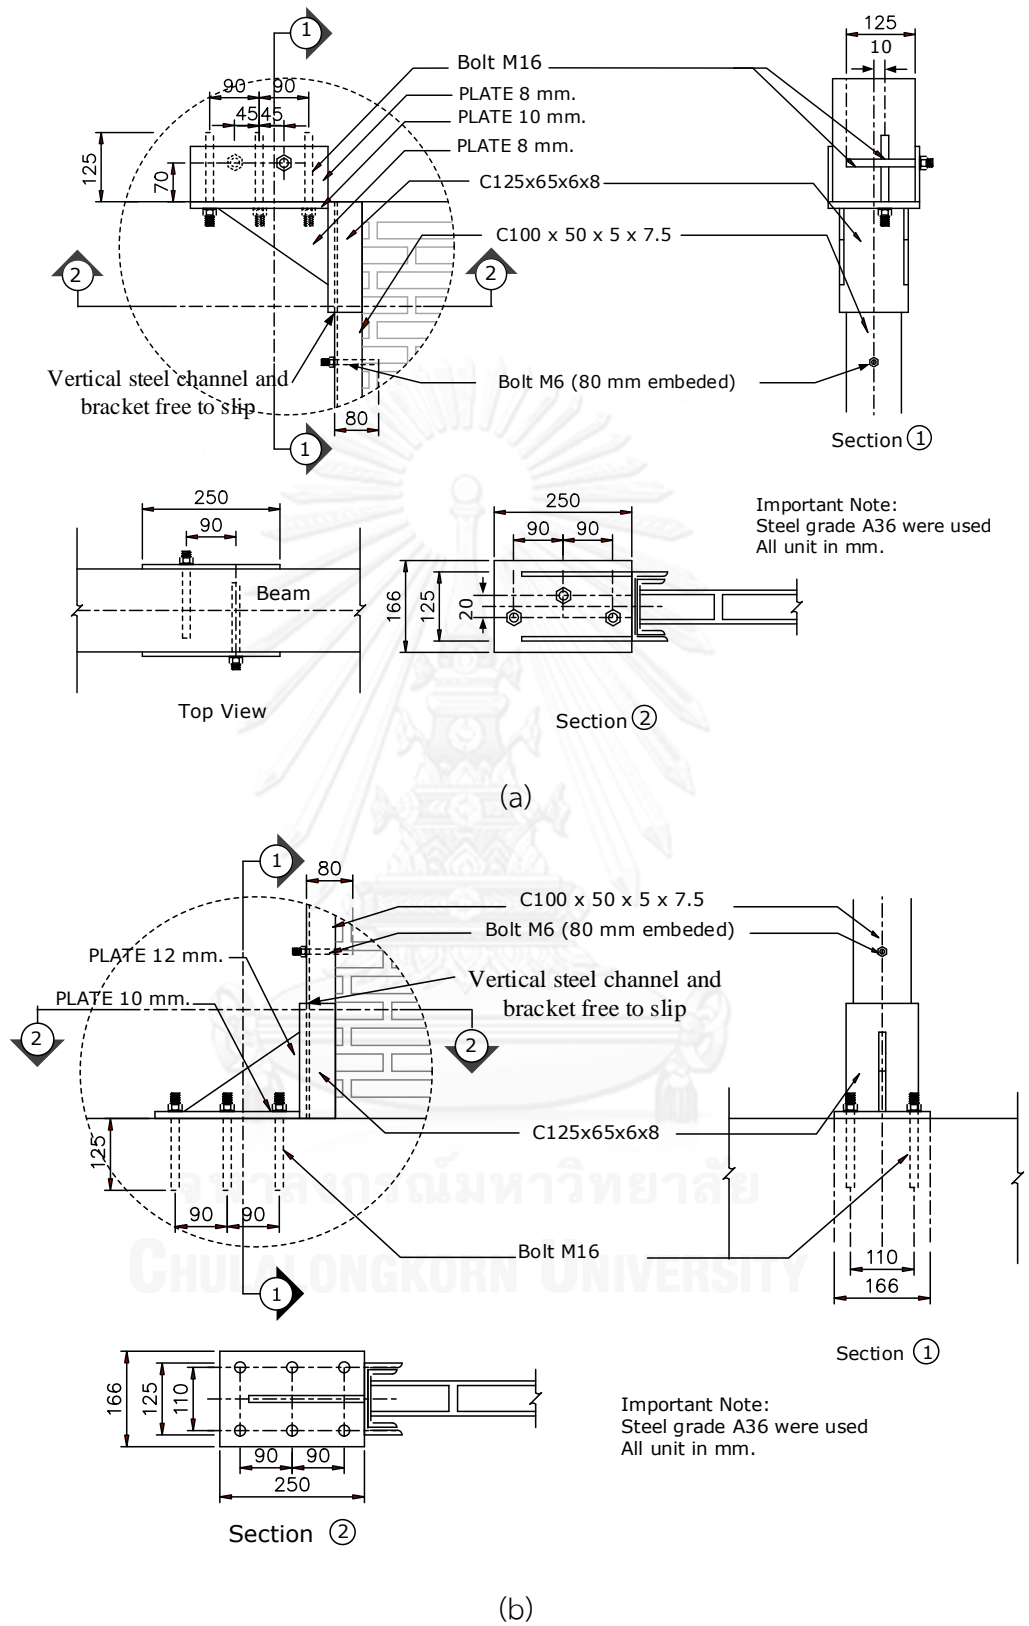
Steel bracket and connection detailing; (a) top corners bracket and (b) bottom corners bracket
